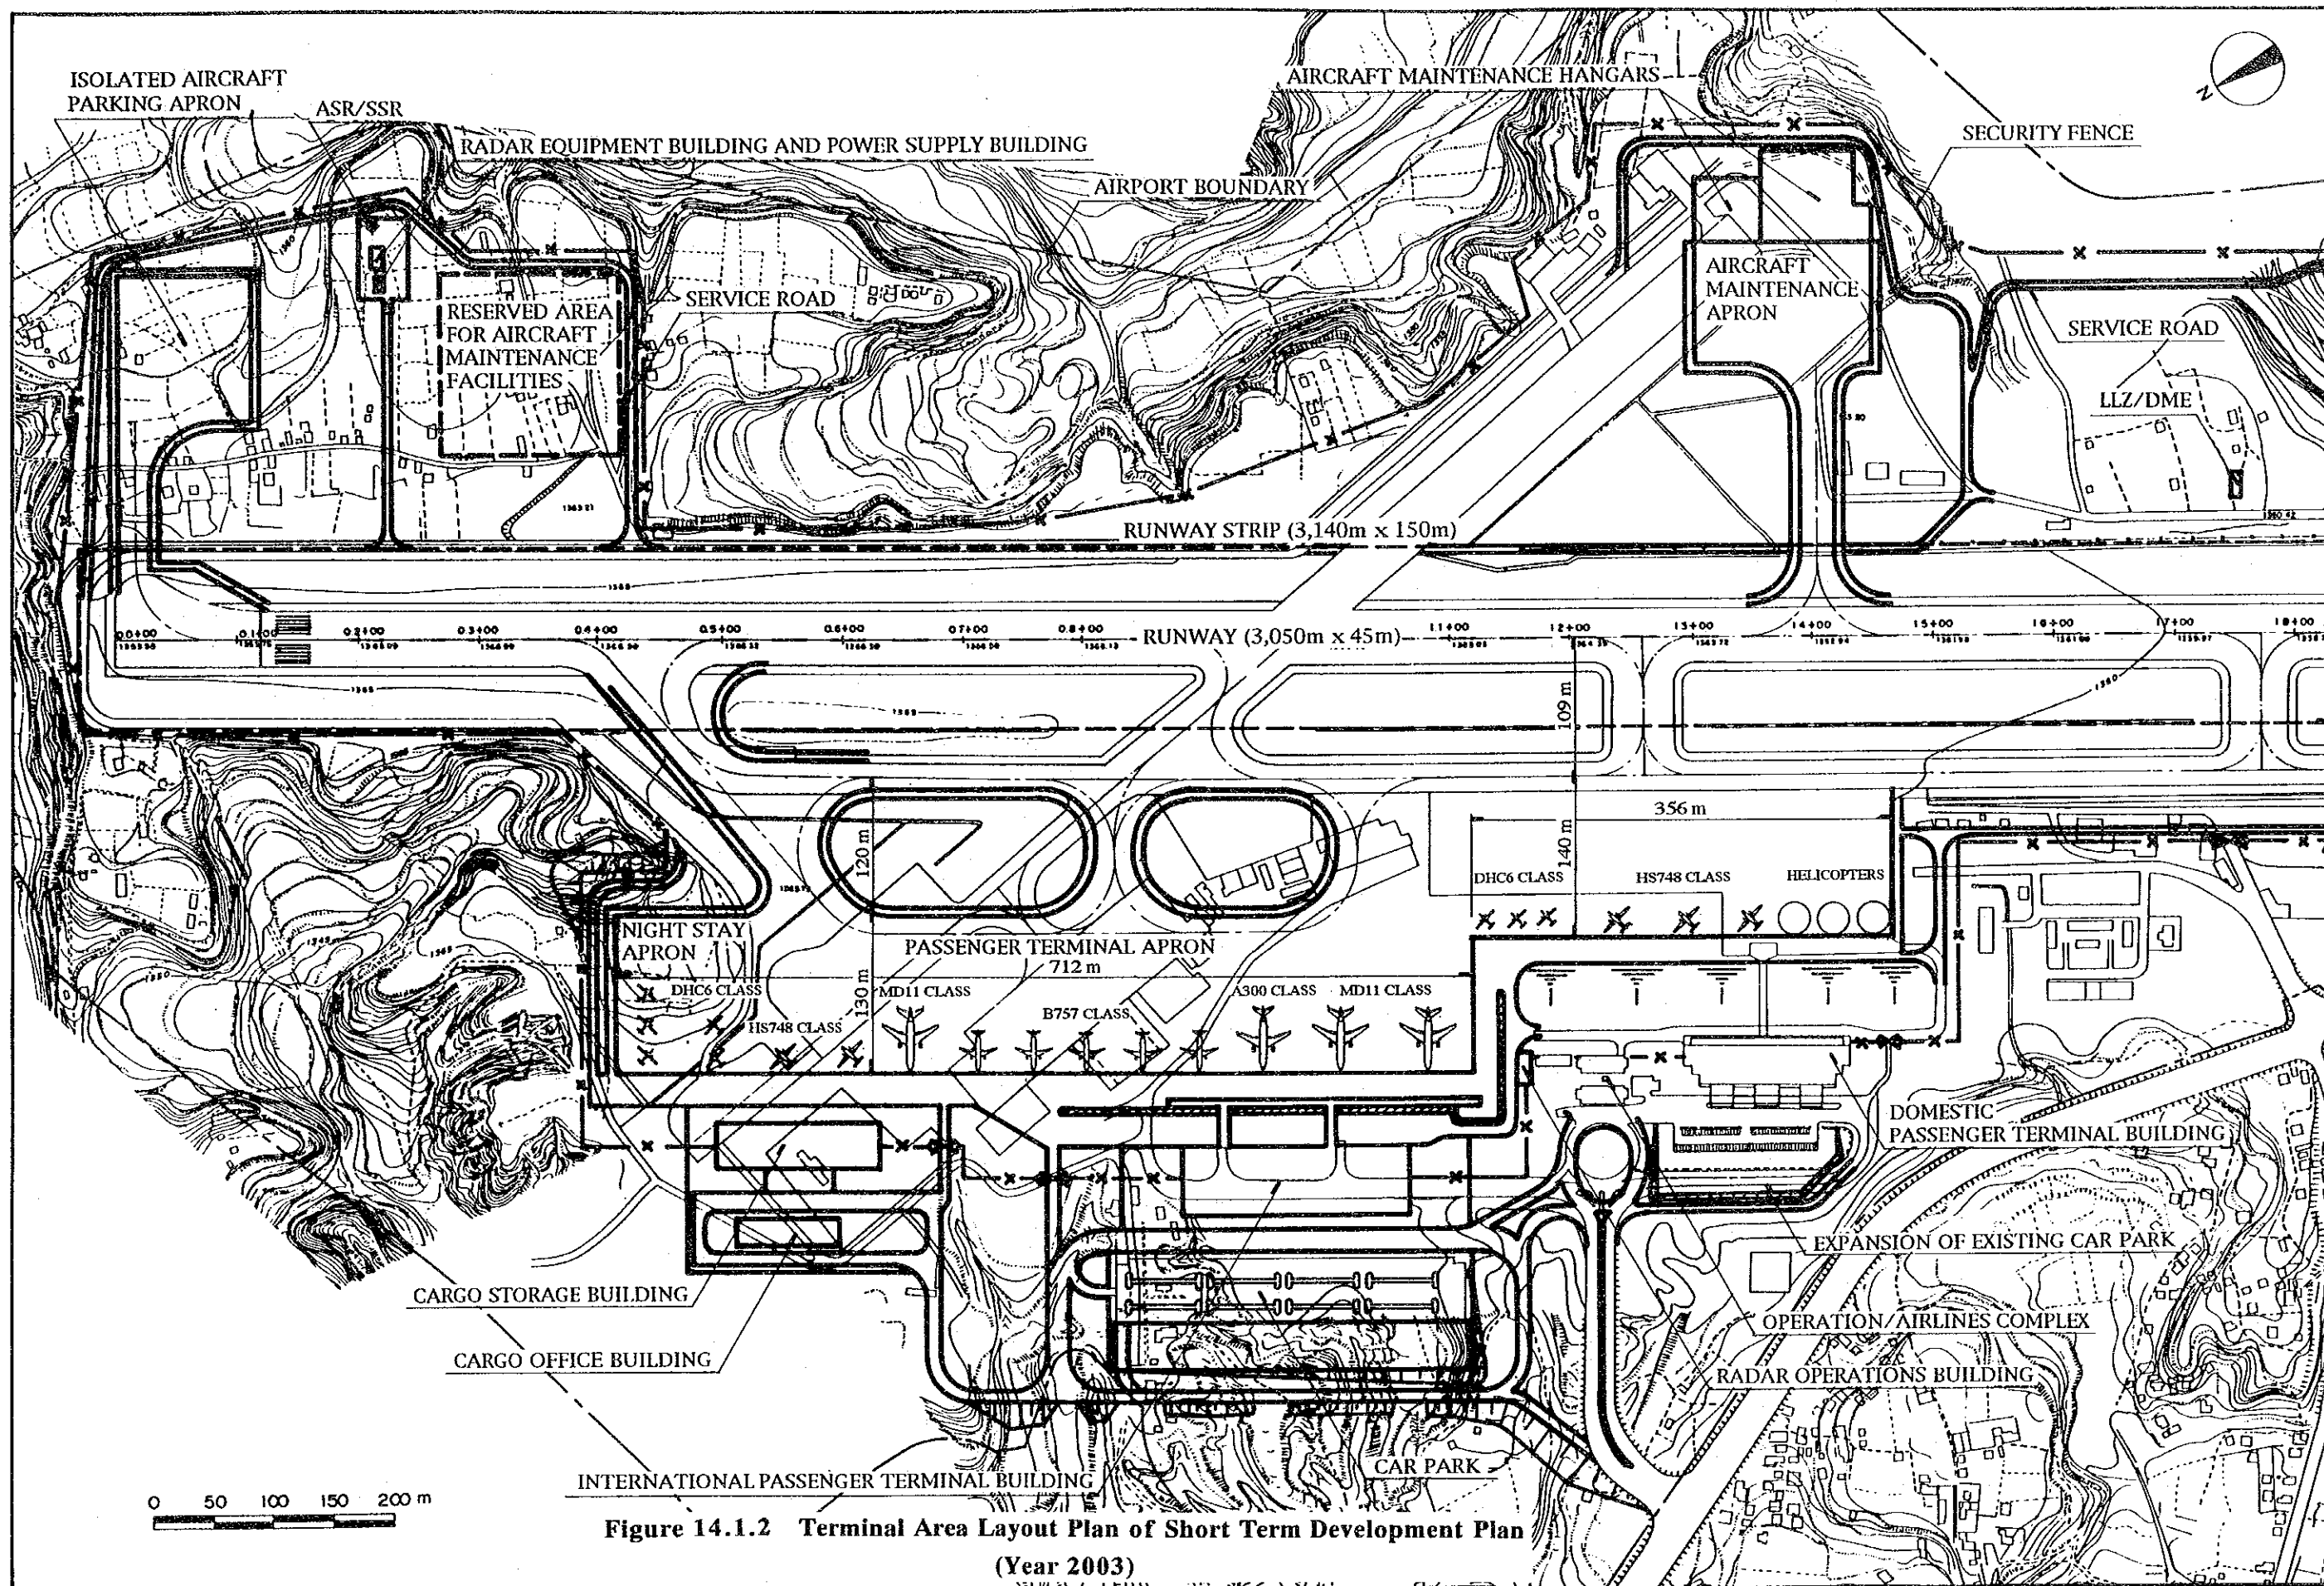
Terminal Area Layout Plan of Short Term Development Plan (Year 2003)
